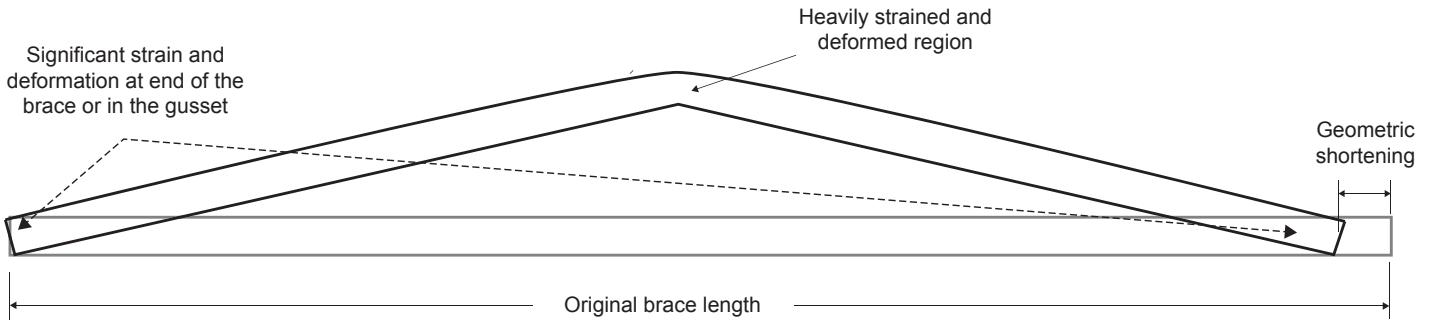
Geometric shortening of the brace and locations of local yield deformation.
